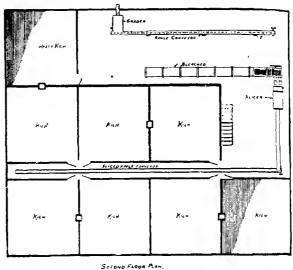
Fig. XIV .-- Second-floor Plan, Eight-kiln Evaporator.
